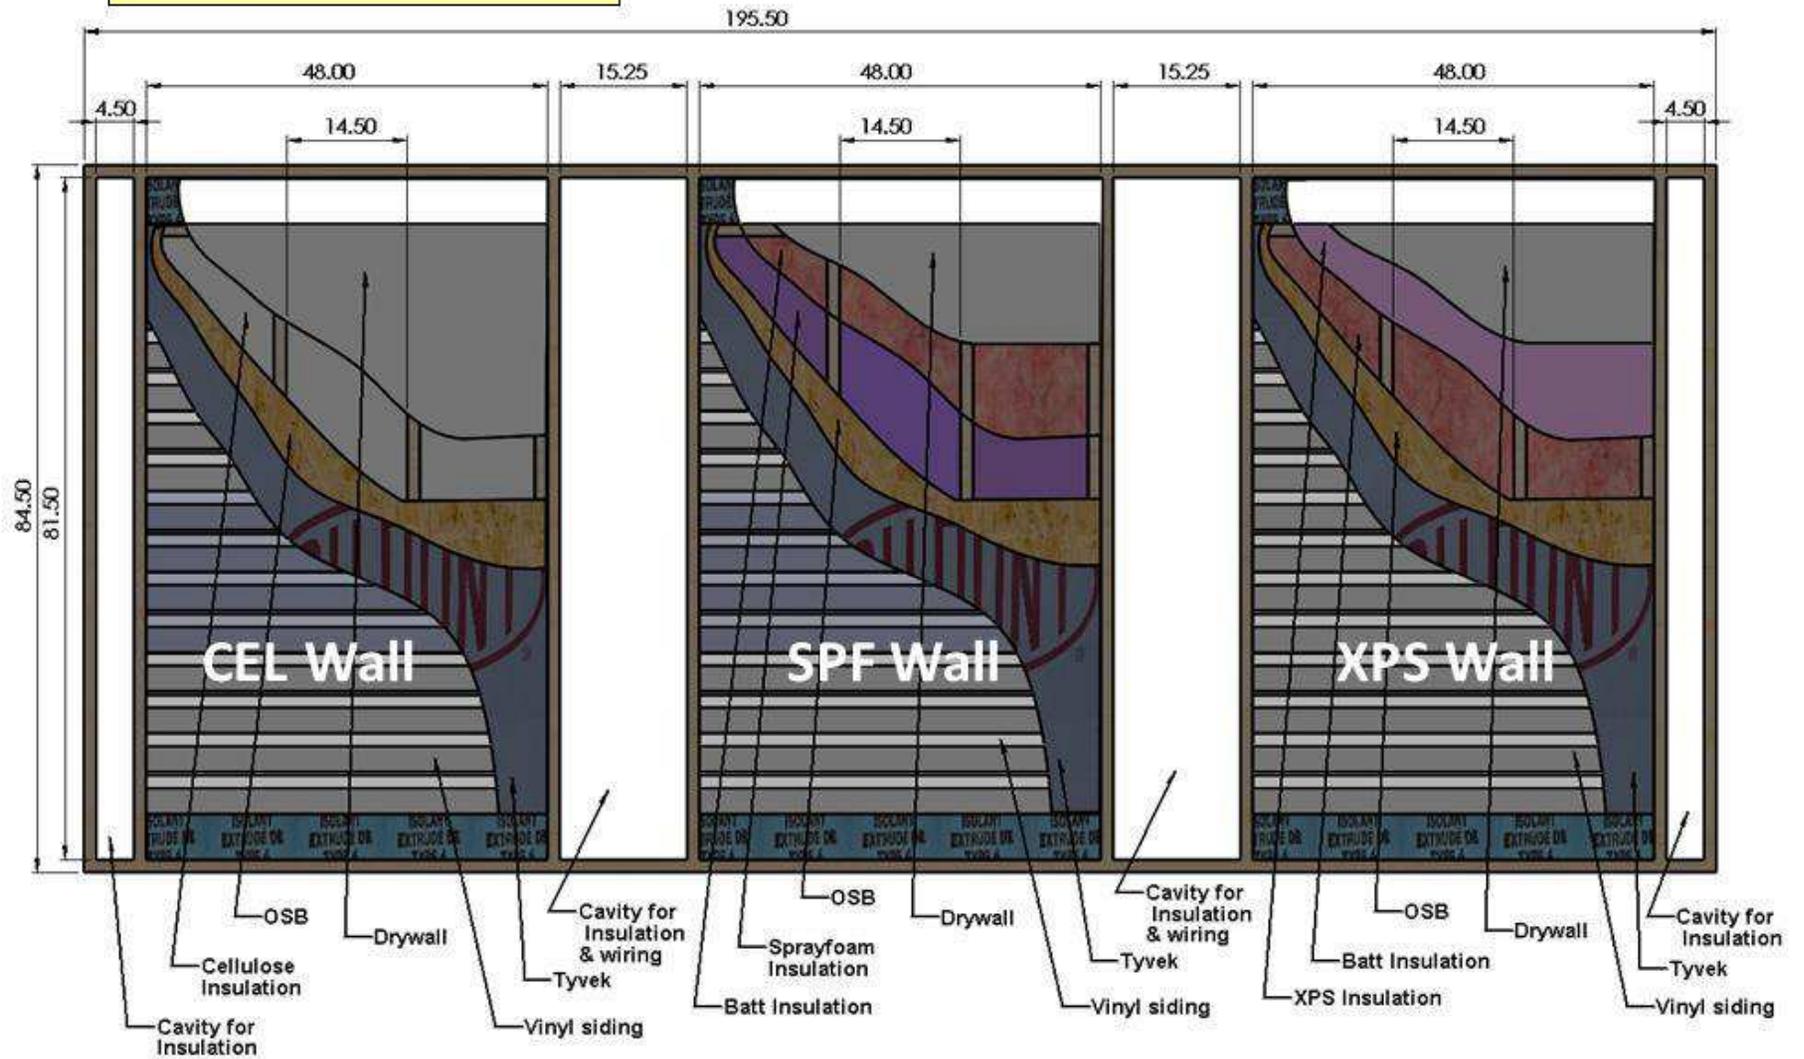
Schematic of three residential wood-frame wall test specimens installed side-by-side in the FEWF
